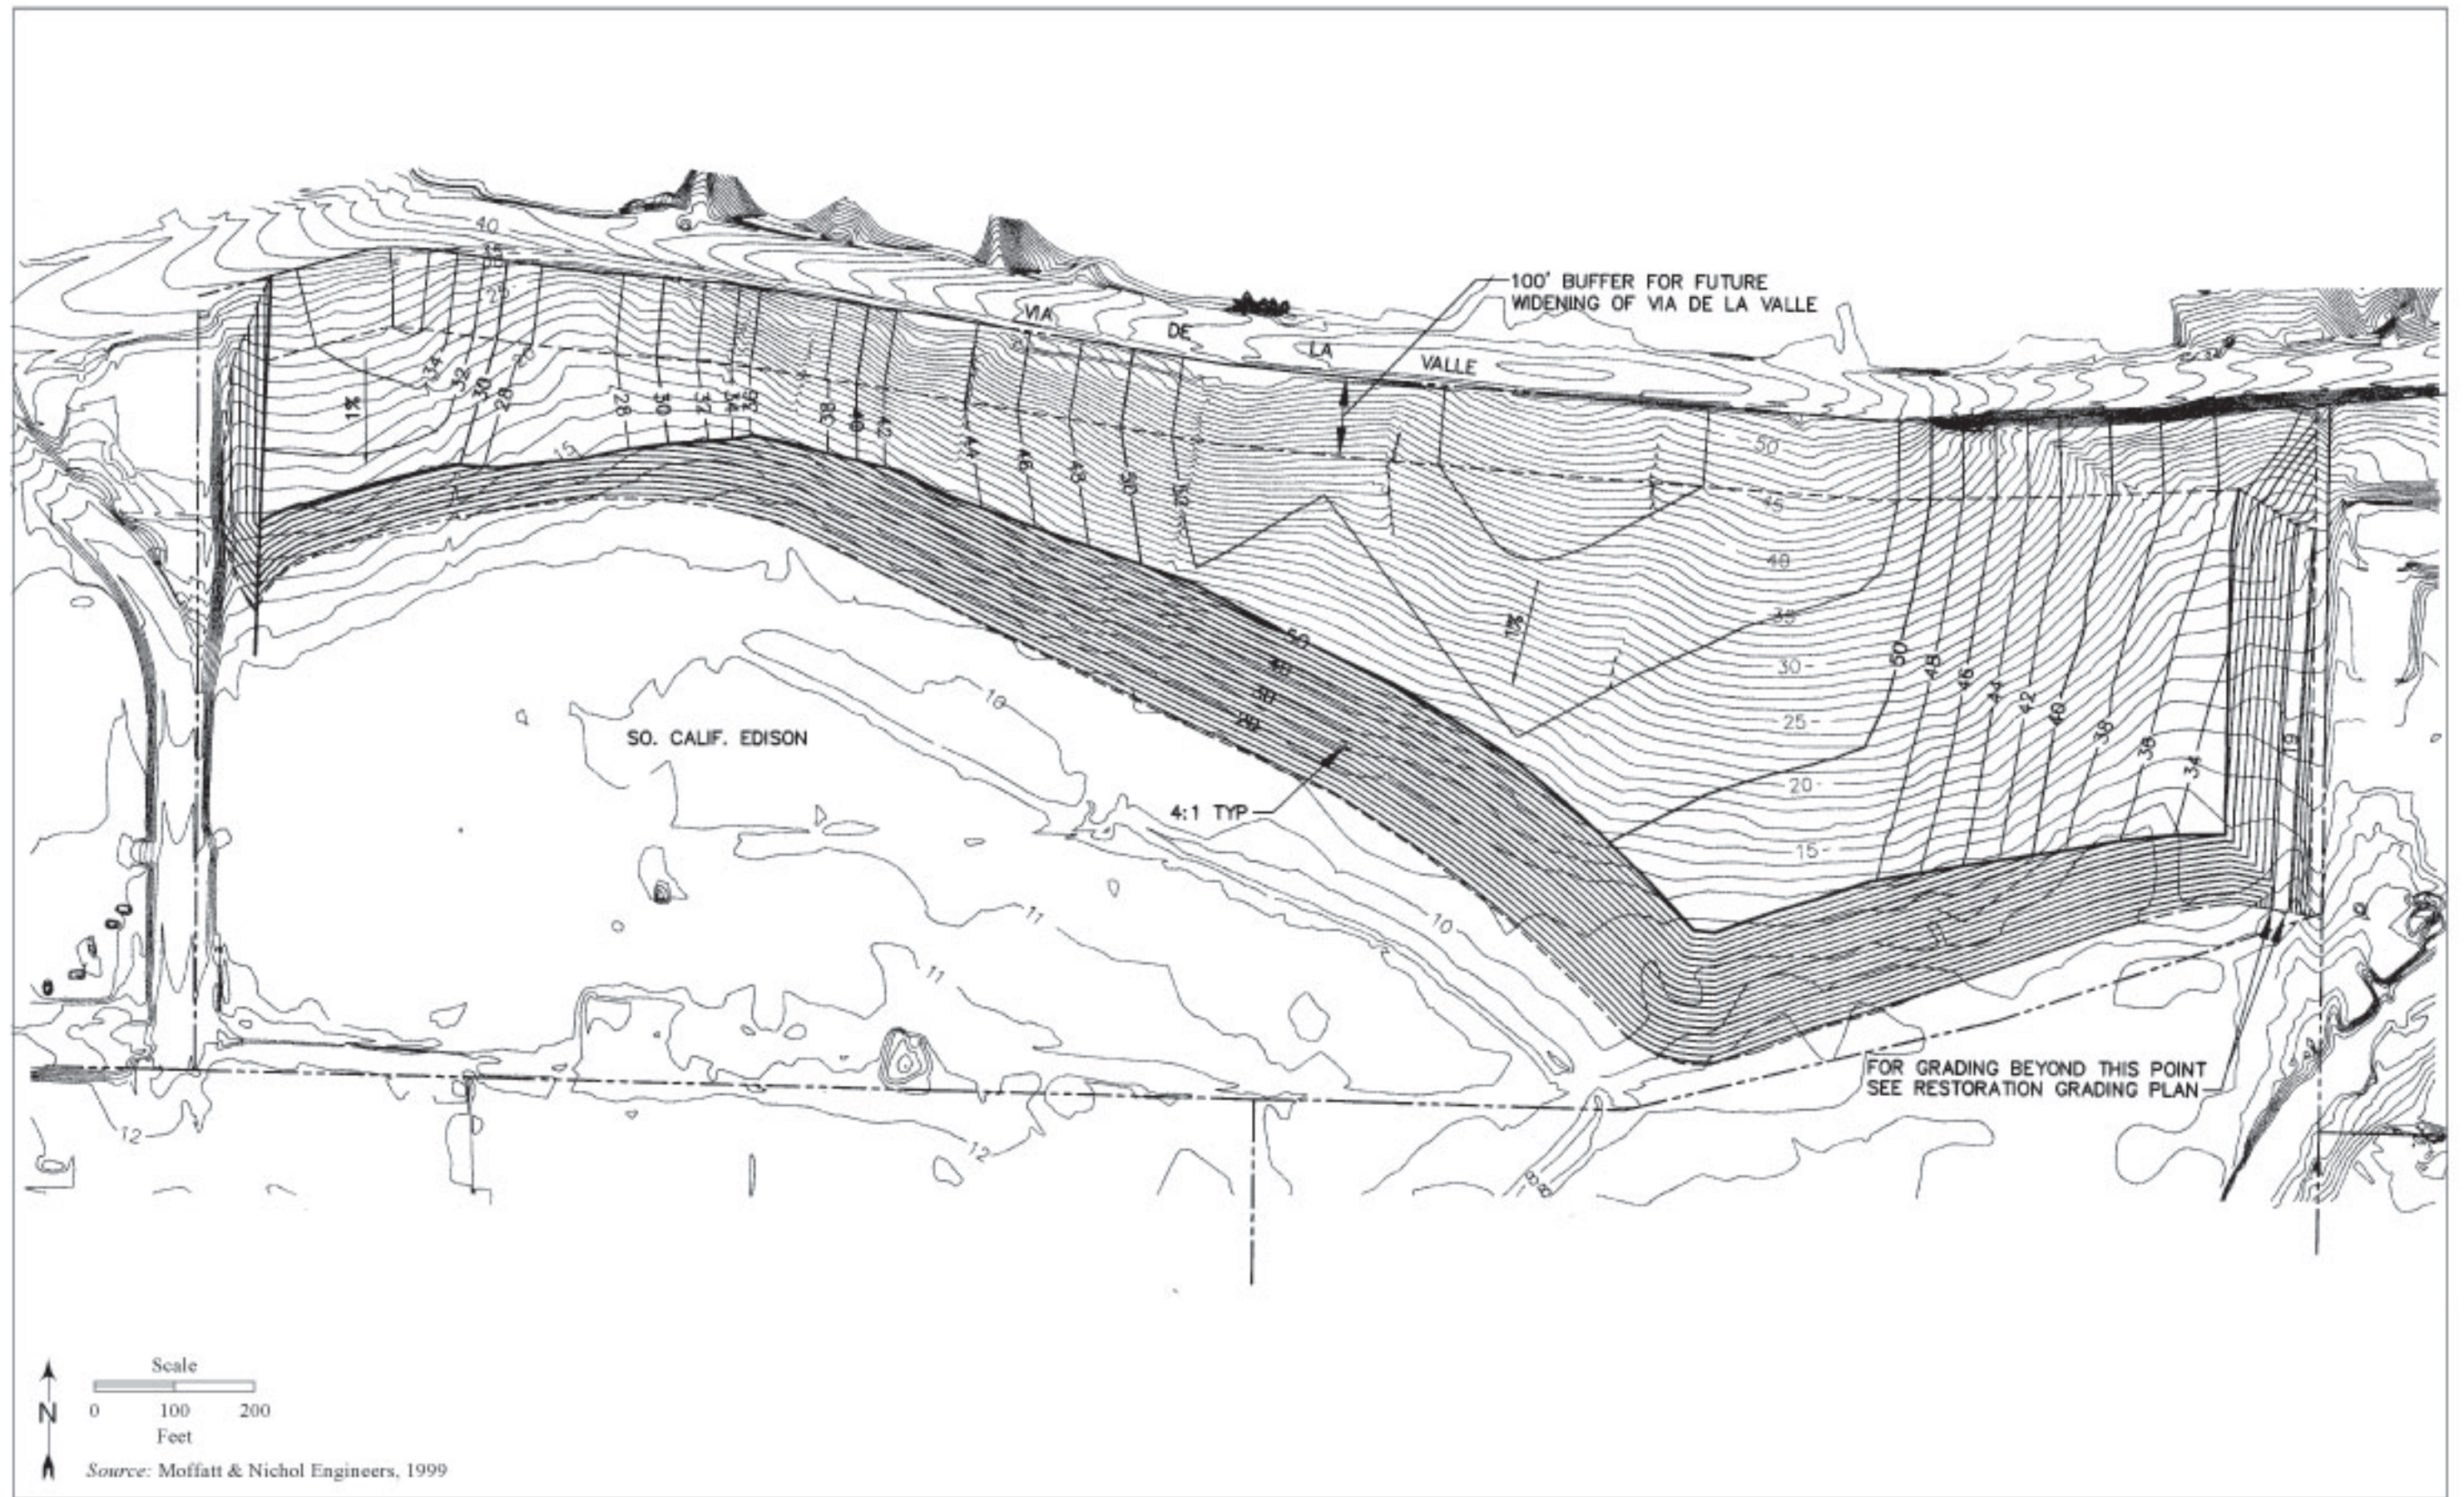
Disposal Site DS32 Grading Plan
